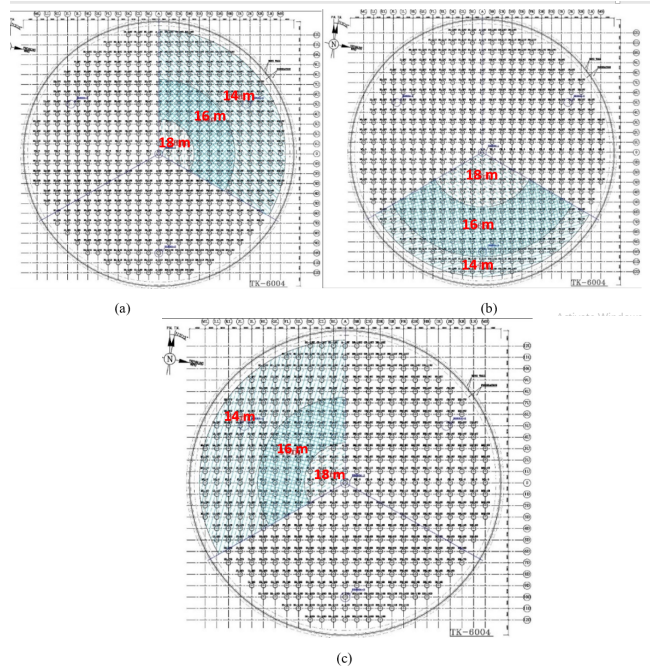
a) section 1-2, b) section 1-3, c) section 1-4 with improvement depths equal to 18, 16 and 14 meters
